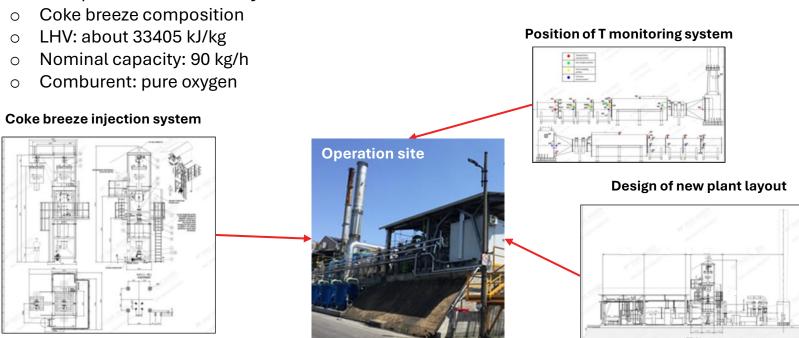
DETAILED ENGINEERING AND ADAPTATION OF THE PILOT PLANT
